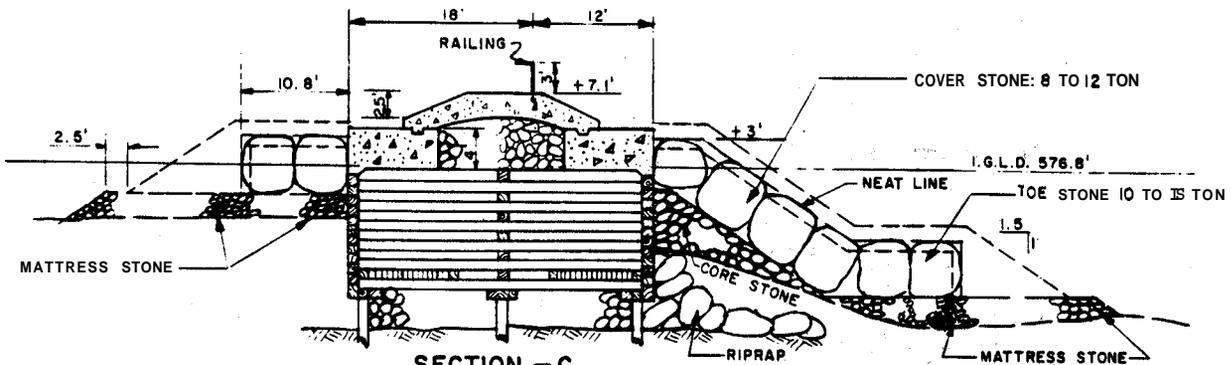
Typical structure cross sections, Ludington Harbor. Michigan
